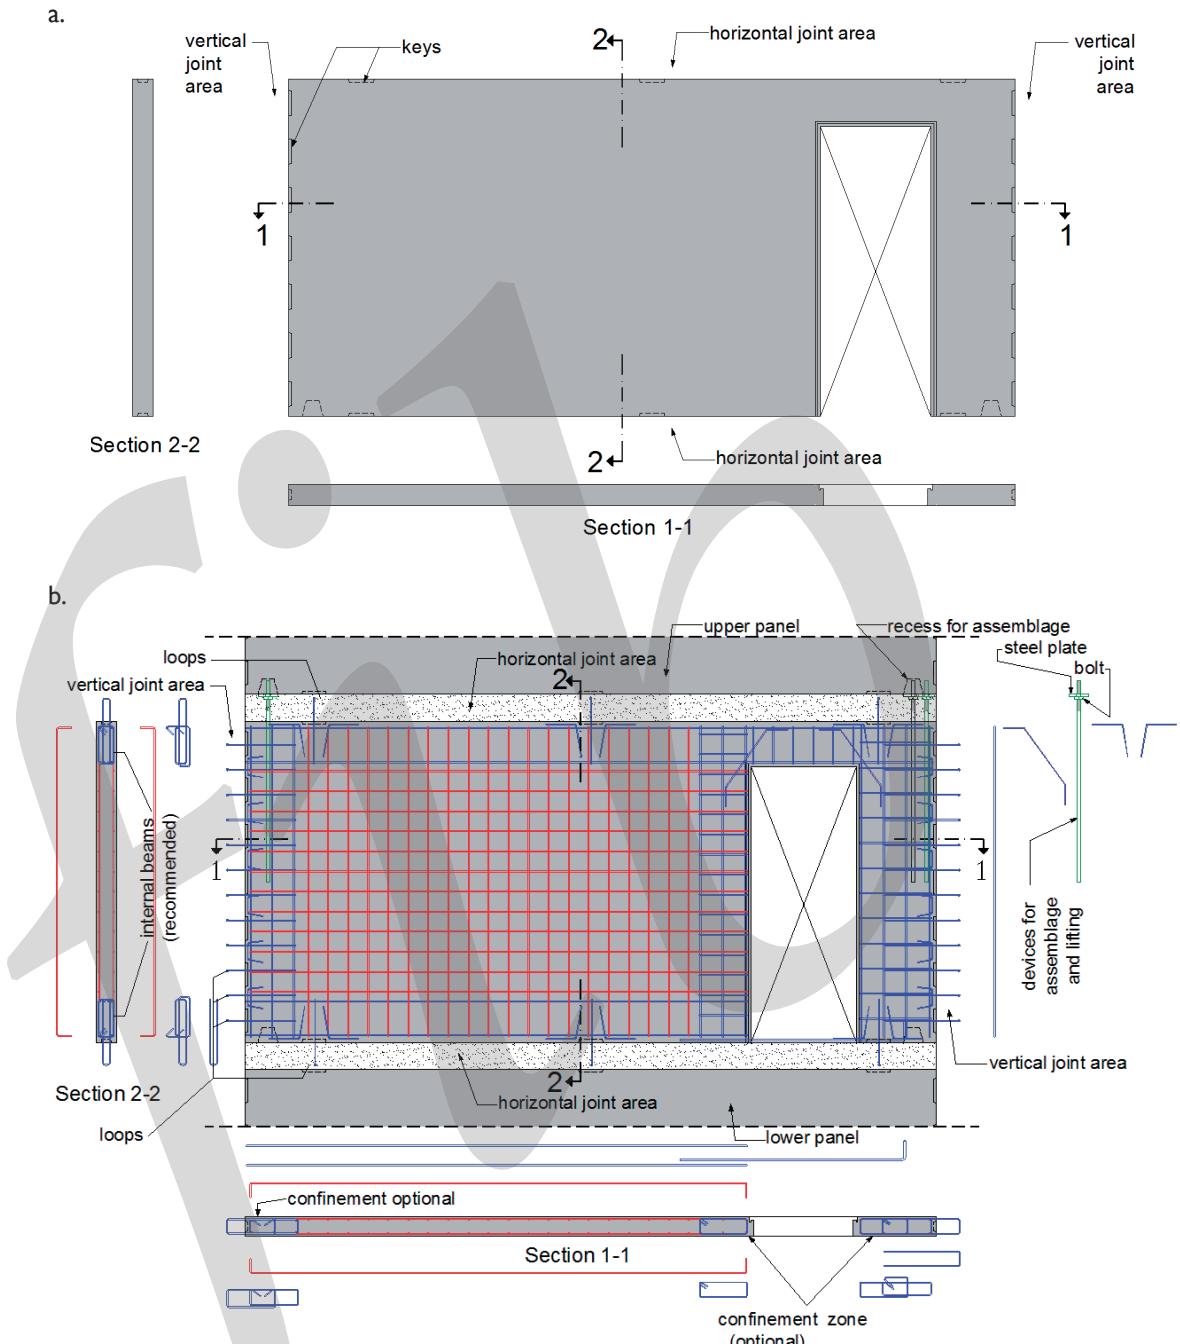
a. Geometry of wall panel with opening where key density along vertical joint is about 50%
